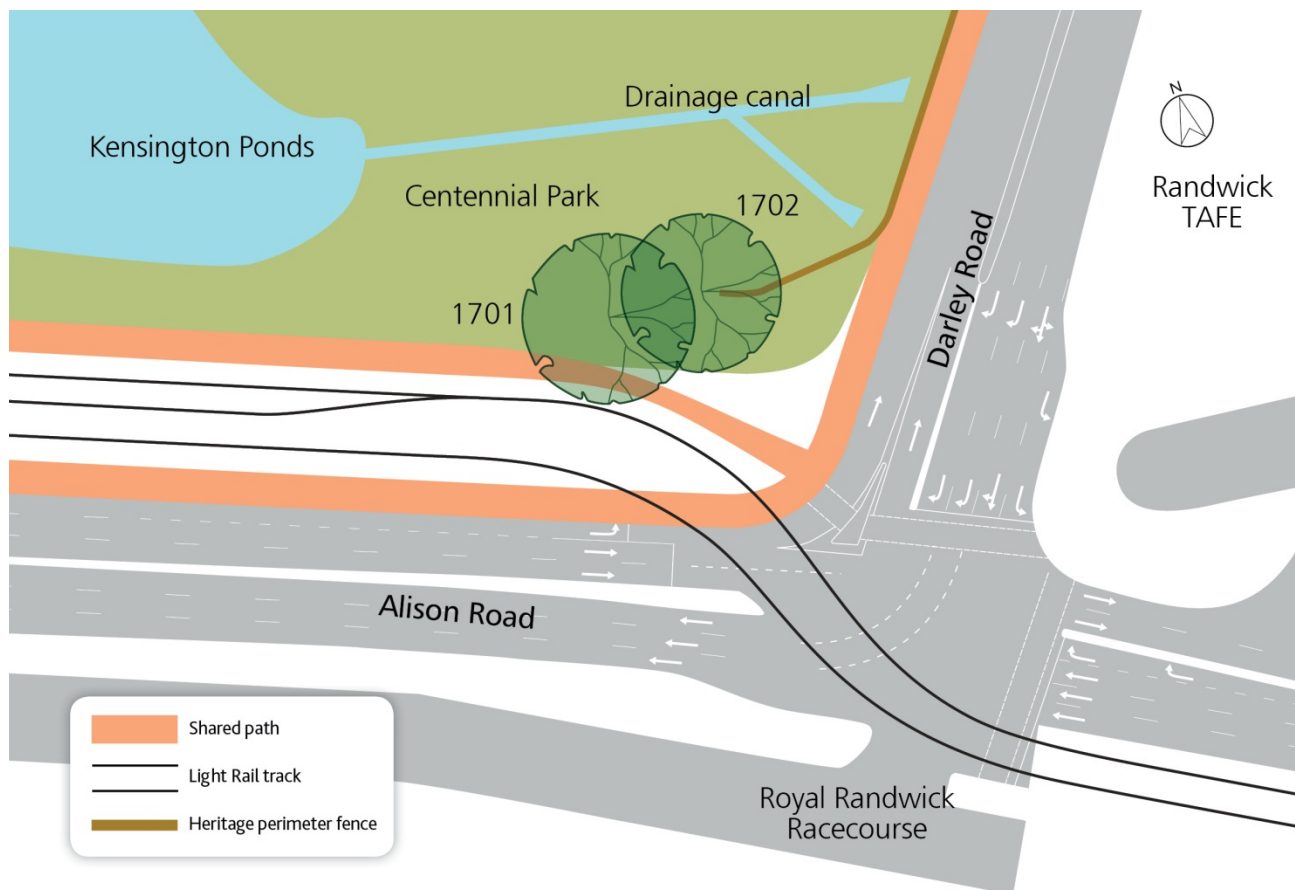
Proposed layout of Option two where the shared path runs adjacent to the track (not to scale).
